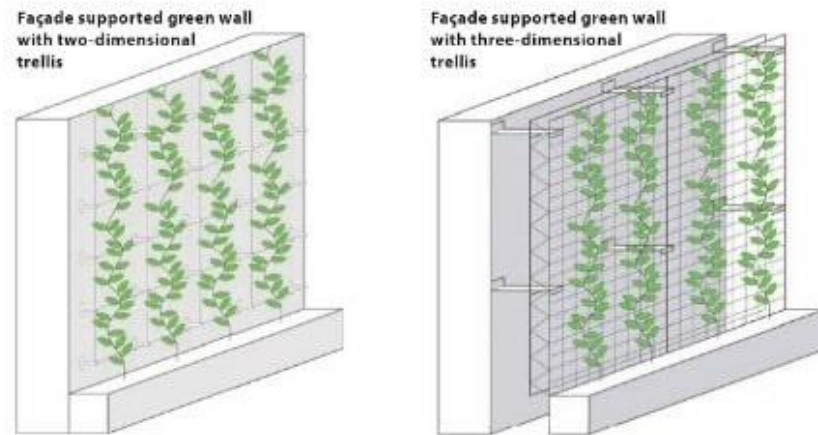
Façade supported green wall. (Source: The Constructor Building ideas, 2022)
